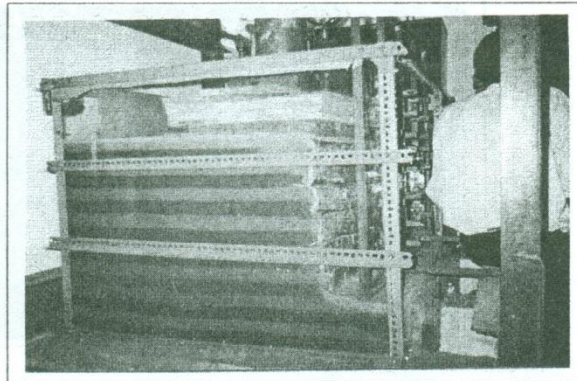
Bamboo Reinforced Earth Structure Loaded Within the Reinforcements
